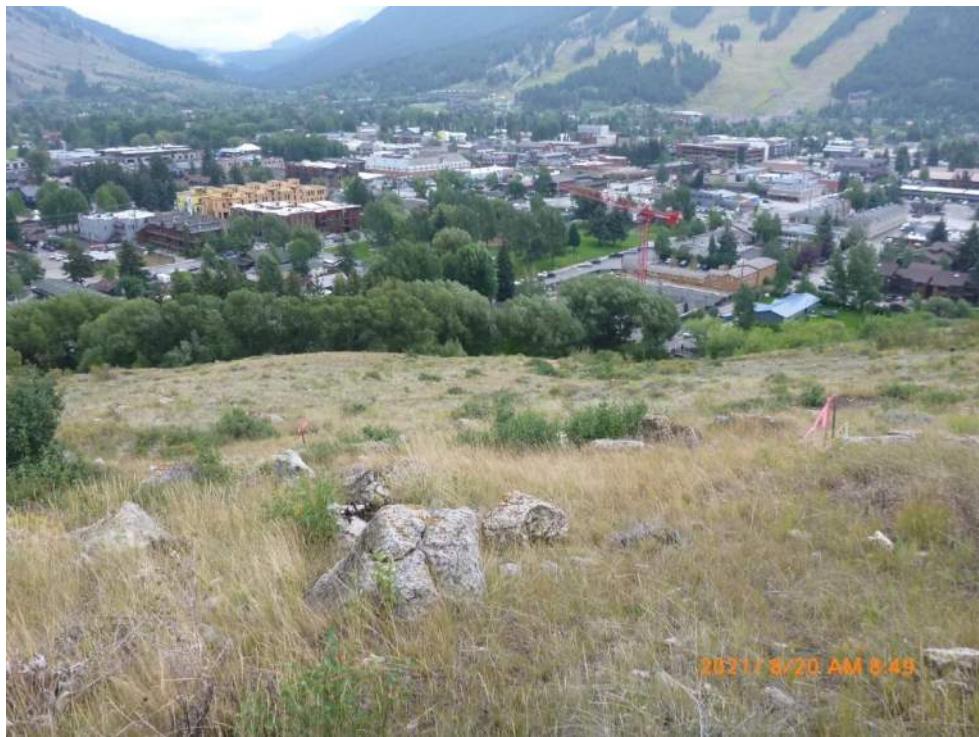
Looking east from outside the Property towards the proposed building envelope (marked with stakes).
